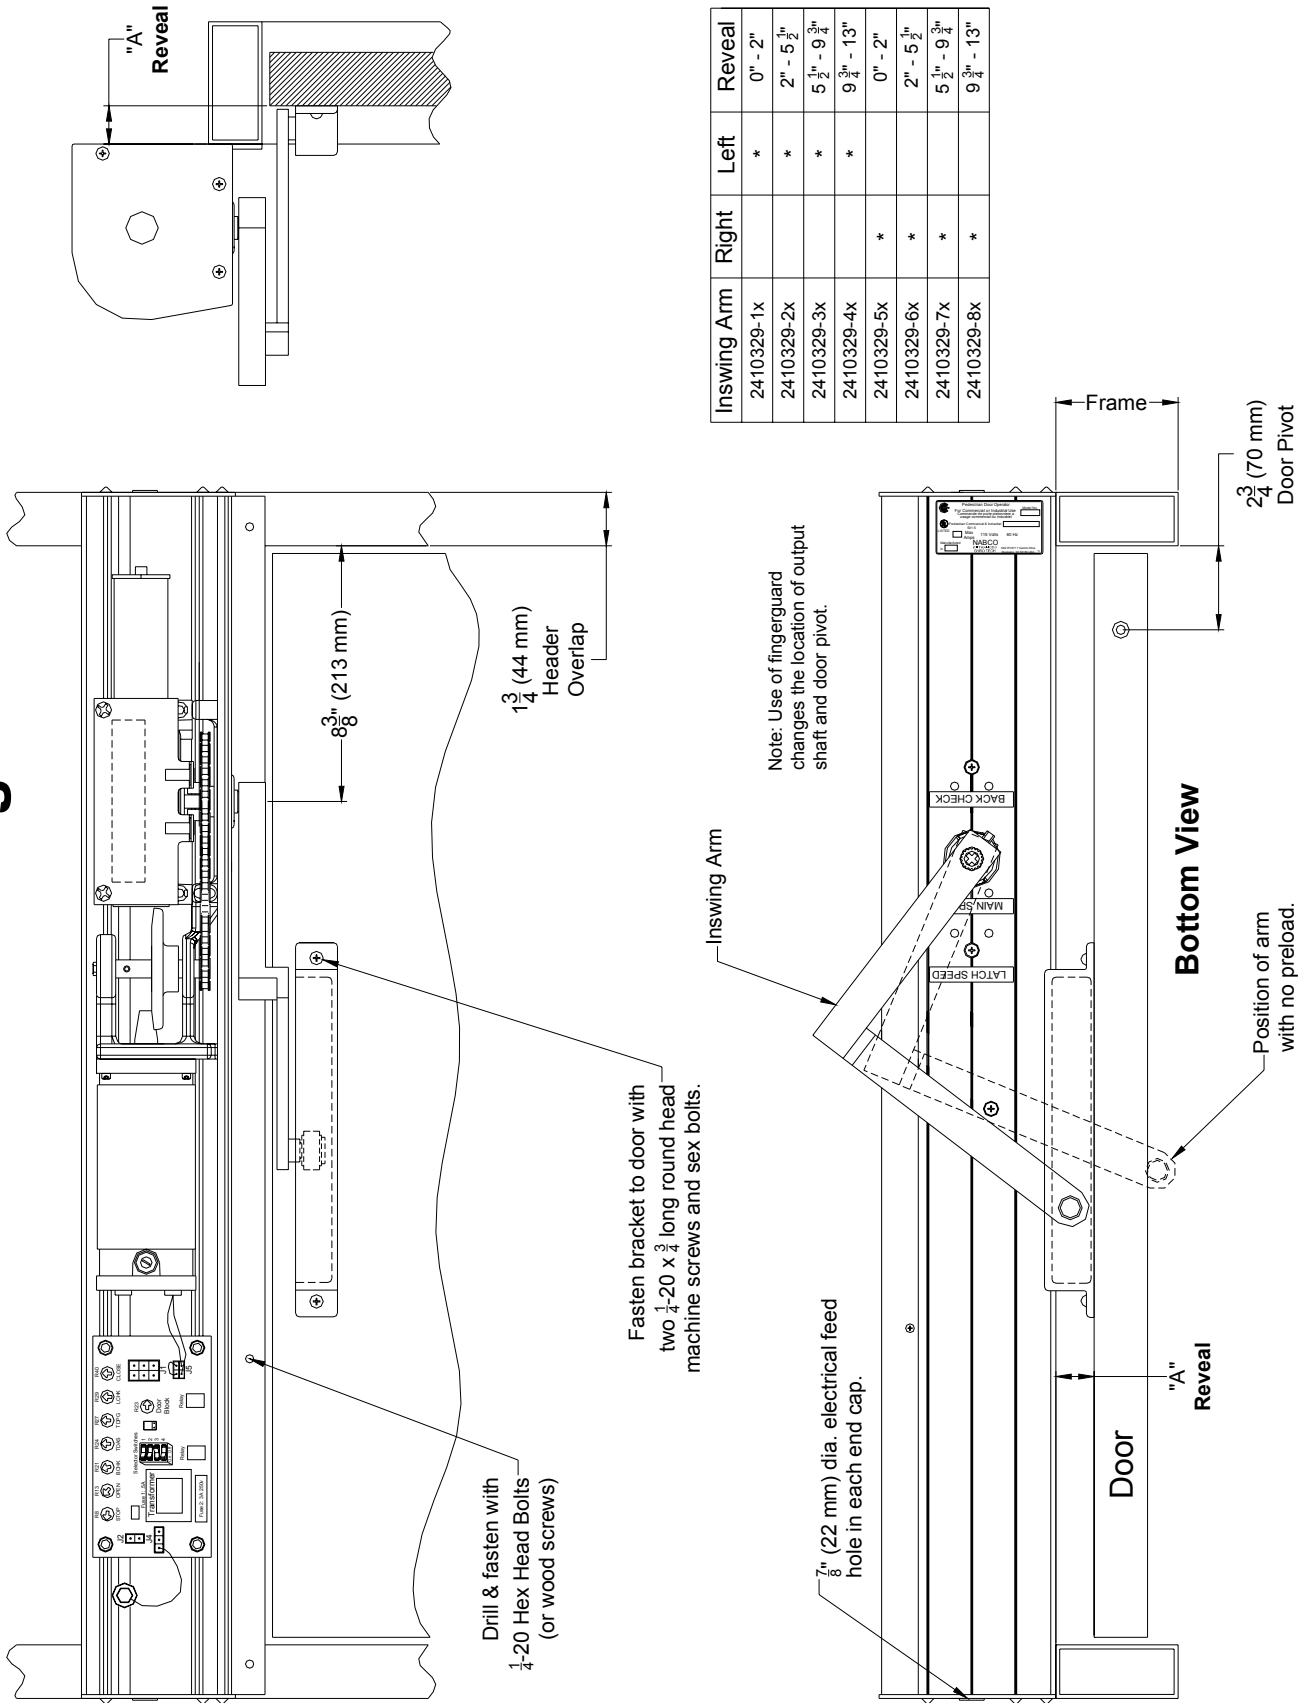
Installation Details, Left Hand Inswing Center Pivoted
